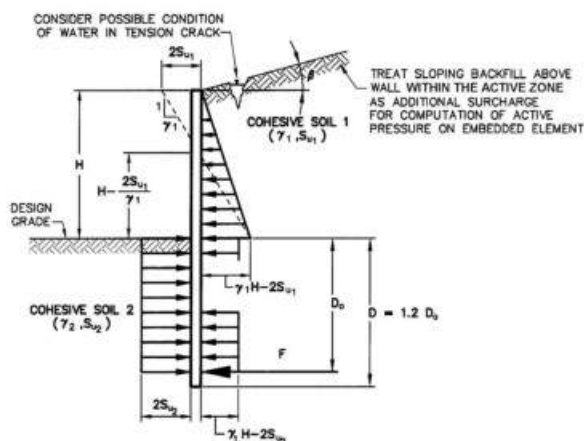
Unfactored Simplified Earth Pressure Distributions for Temporary Nongravity Cantilevered Walls with Continuous Vertical Wall Elements Embedded in Cohesive Soil and Retaining Cohesive Soil Modified after Teng (1962)
